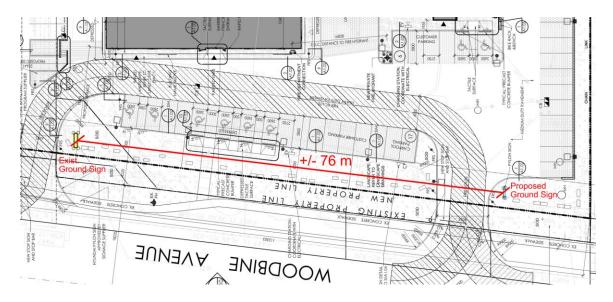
Site Plan Depicting Ground Sign Locations and Separation Distance
